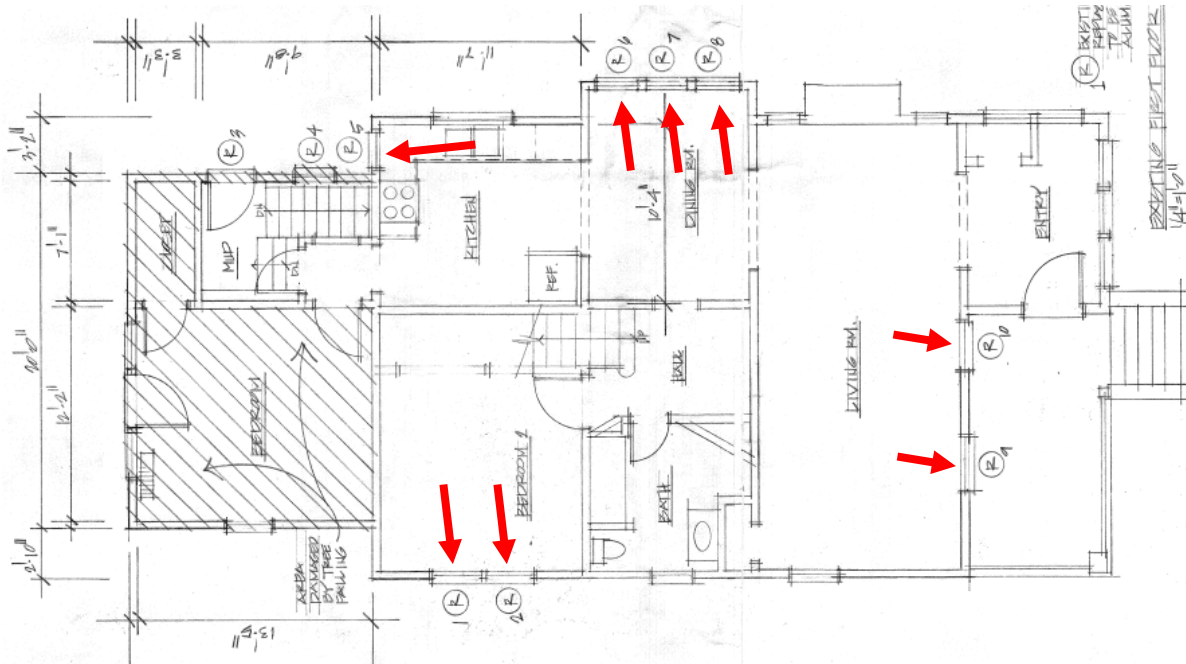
View of the first-floor plan showing the location (red arrows) of the eight vinyl-sash windows to be replaced.
